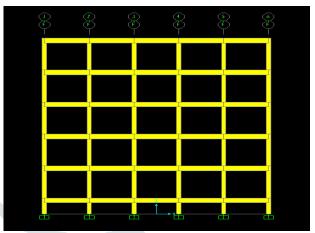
5 Storied Building without Water Tank – Elevation
